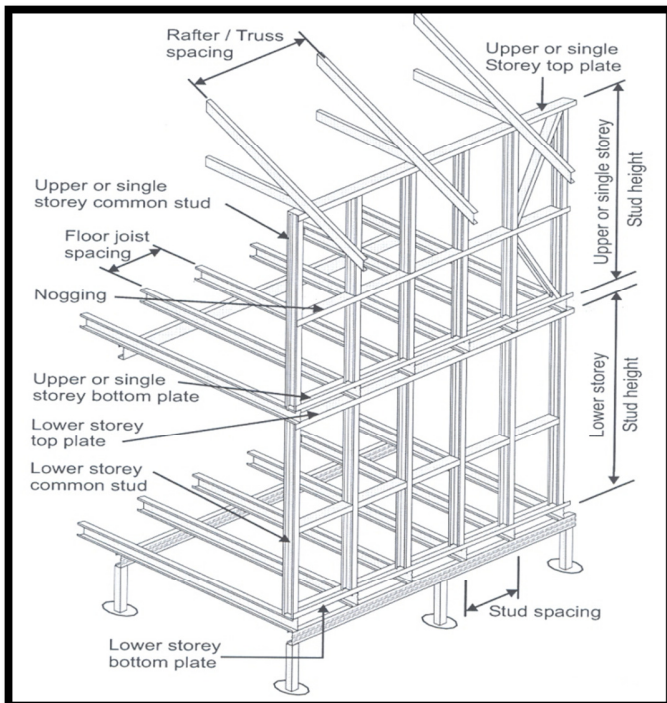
Typical elements in suspended floors (SASFA, 2010)
